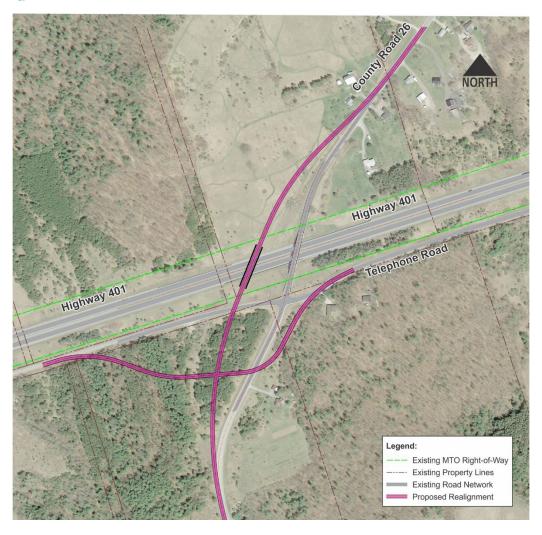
County Road 26 Bridge Replacement – Alternative 1 (Replace bridge to the far west)
